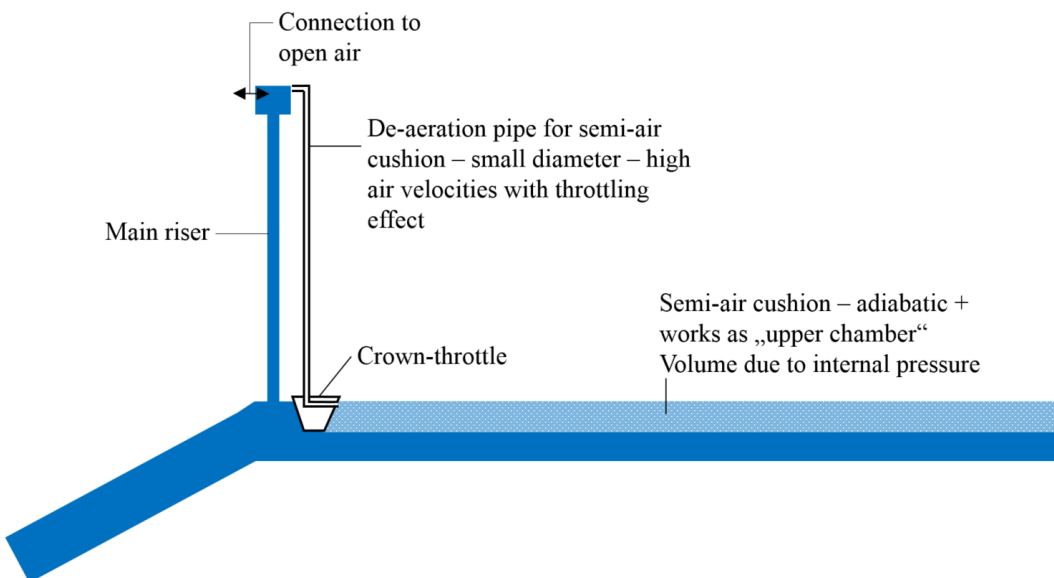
Layout of a proposed *Tonstad* surge tank expansion with proposed attached additional lower chamber and suggested development of semi-air cushion, schematic longitudinal section
